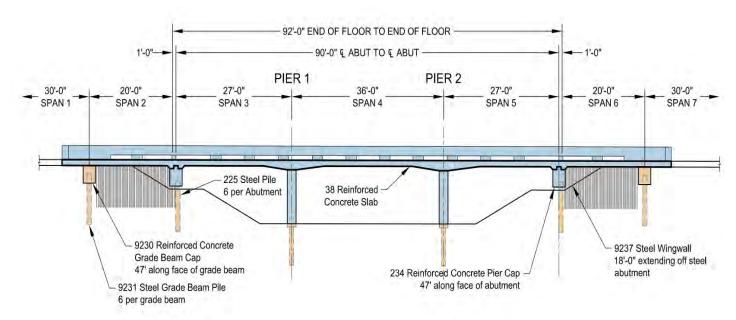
EI.24.3-1: Elevation view of continuous concrete slab bridge
